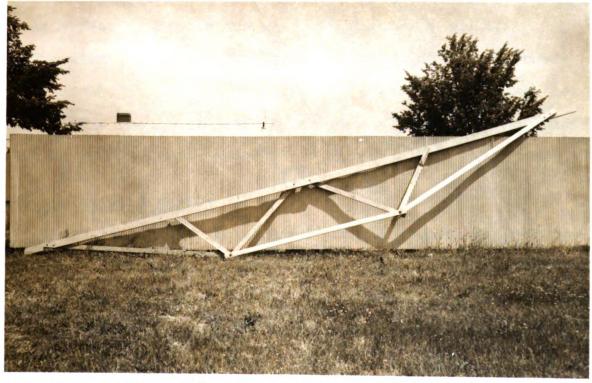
TRUSS "B" - RING-BOLT CONSTRUCTION
